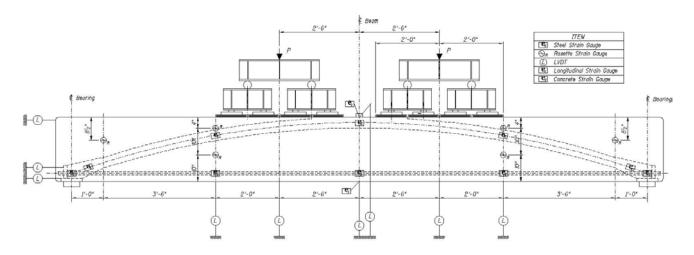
Elevation of Test Set-Up and Instrumentation Plan
